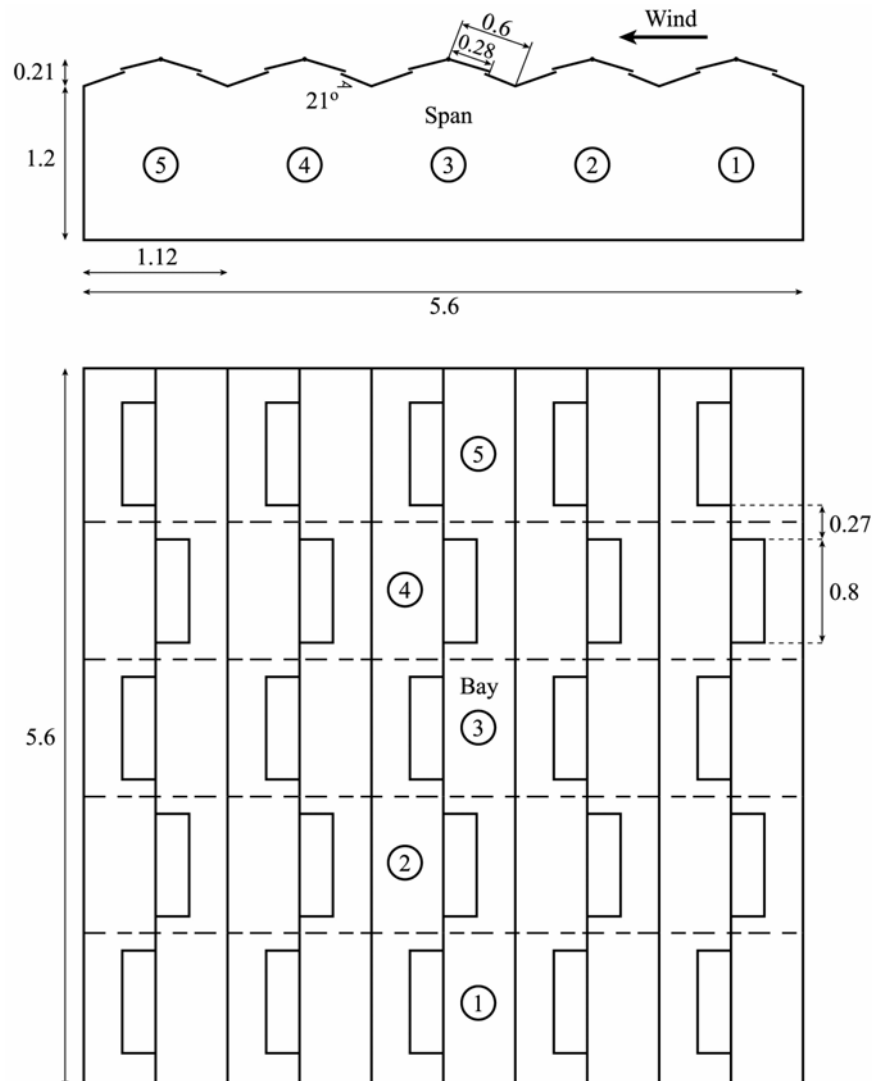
Side elevation and plan view of 5-span and 5-bay model glasshouse (dimensions in m)
